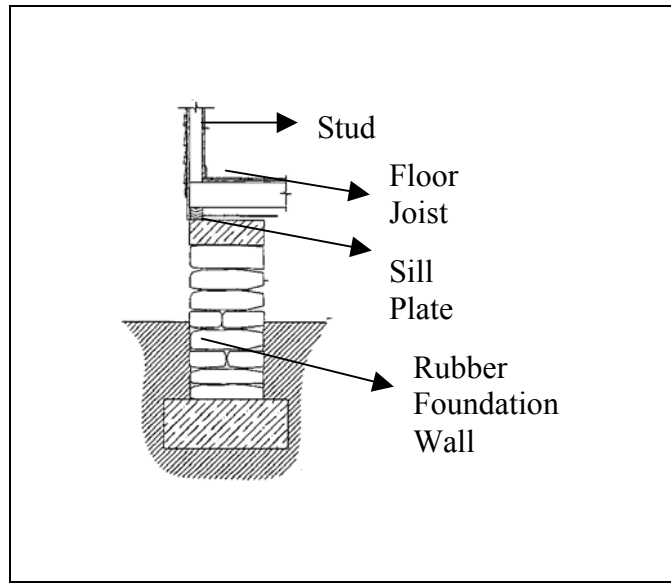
Masonry Foundation with Reinforced Concrete Footing and Lintel According to Turkish Building Regulation
